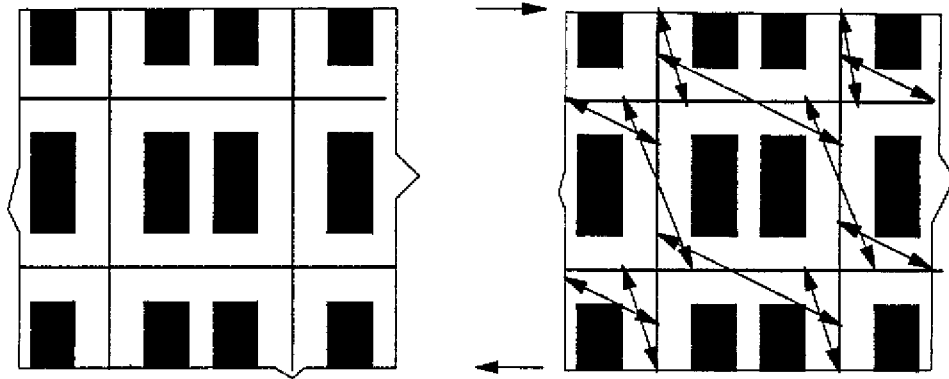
Typical Compressive Fields in Laterally Loaded Penetrated Wall Panel
